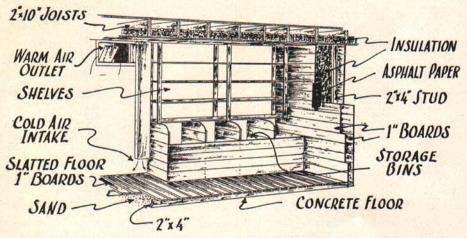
If available, a well ventilated and insulated basement storage is the most convenient place in which to store vegetables.
